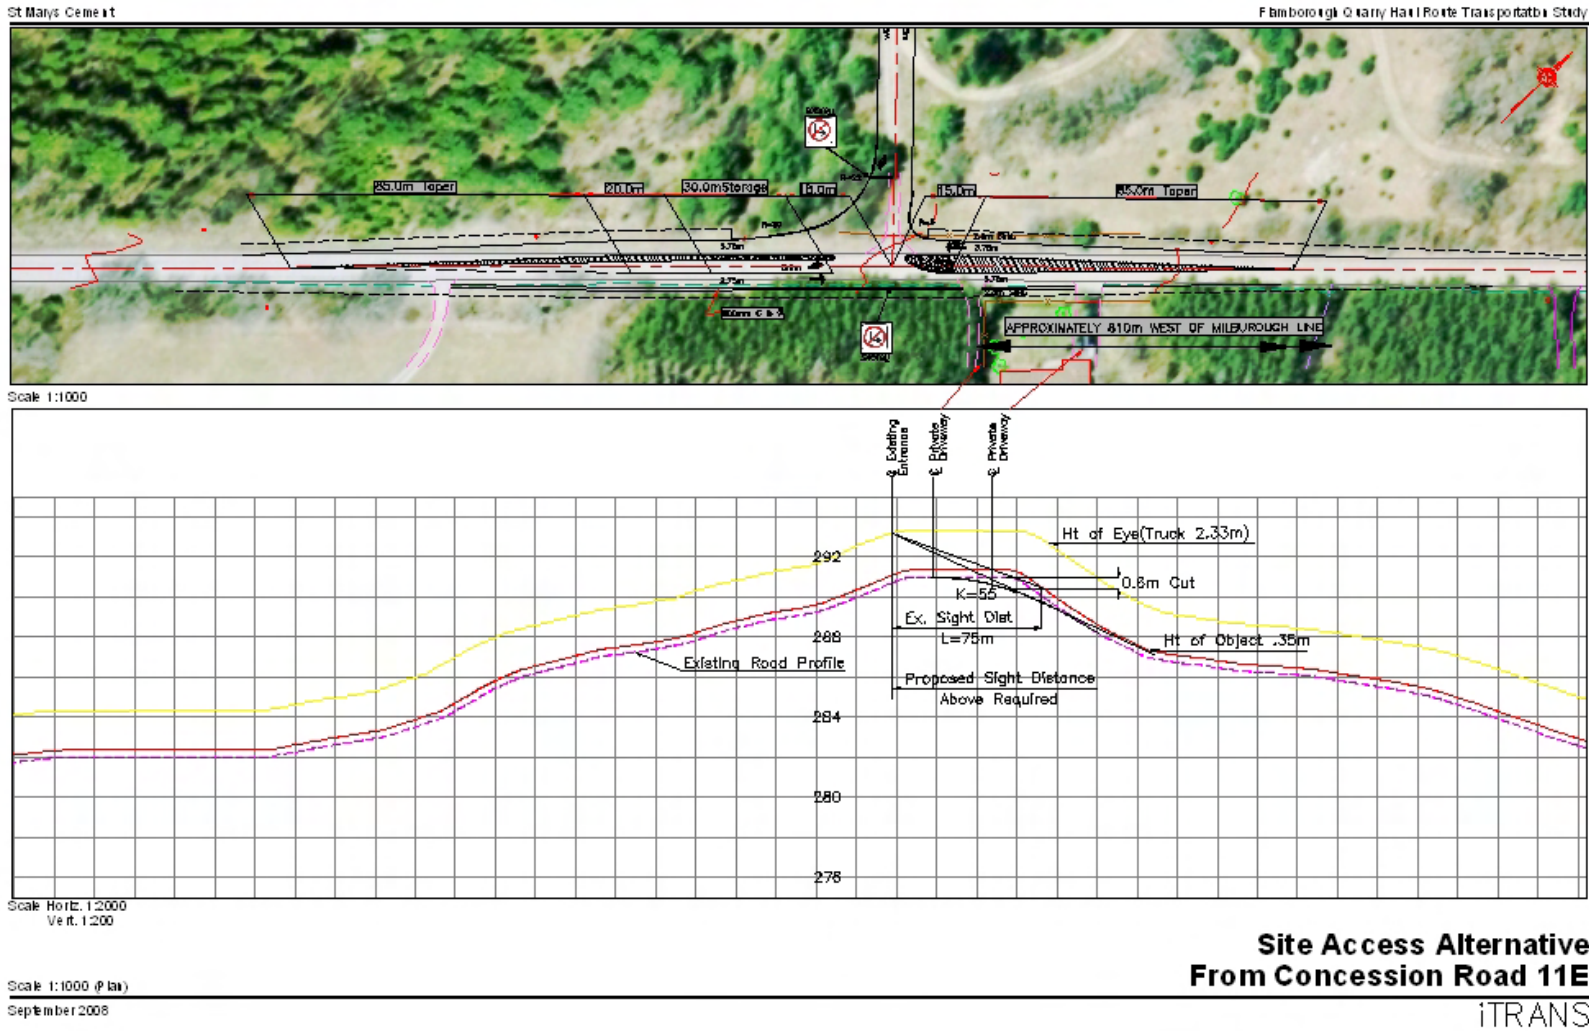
Recommended Design of Site Access on Concession 11
